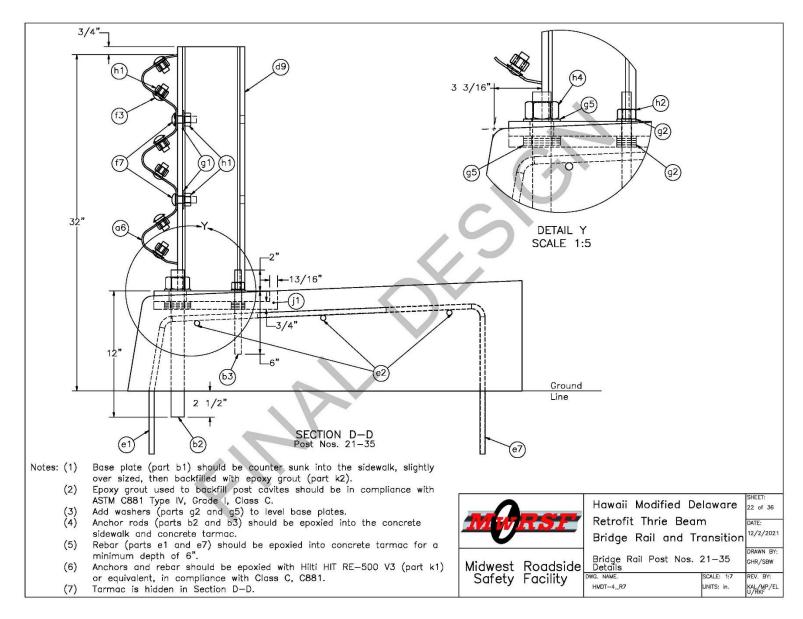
Bridge Rail Post Nos. 21 through 35 Details, Test No. HMDT-4
